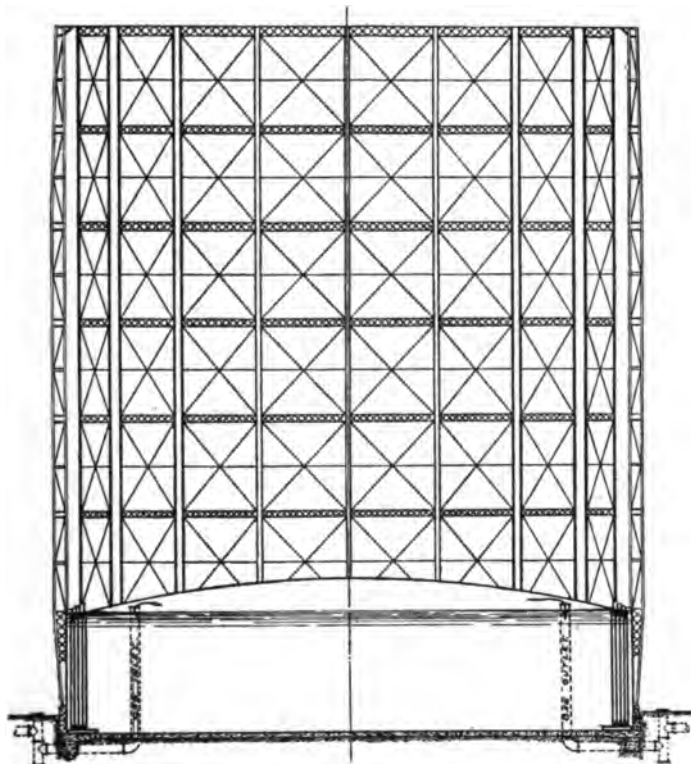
CROSS SECTION OF A GAS HOLDER GROUNDED.
